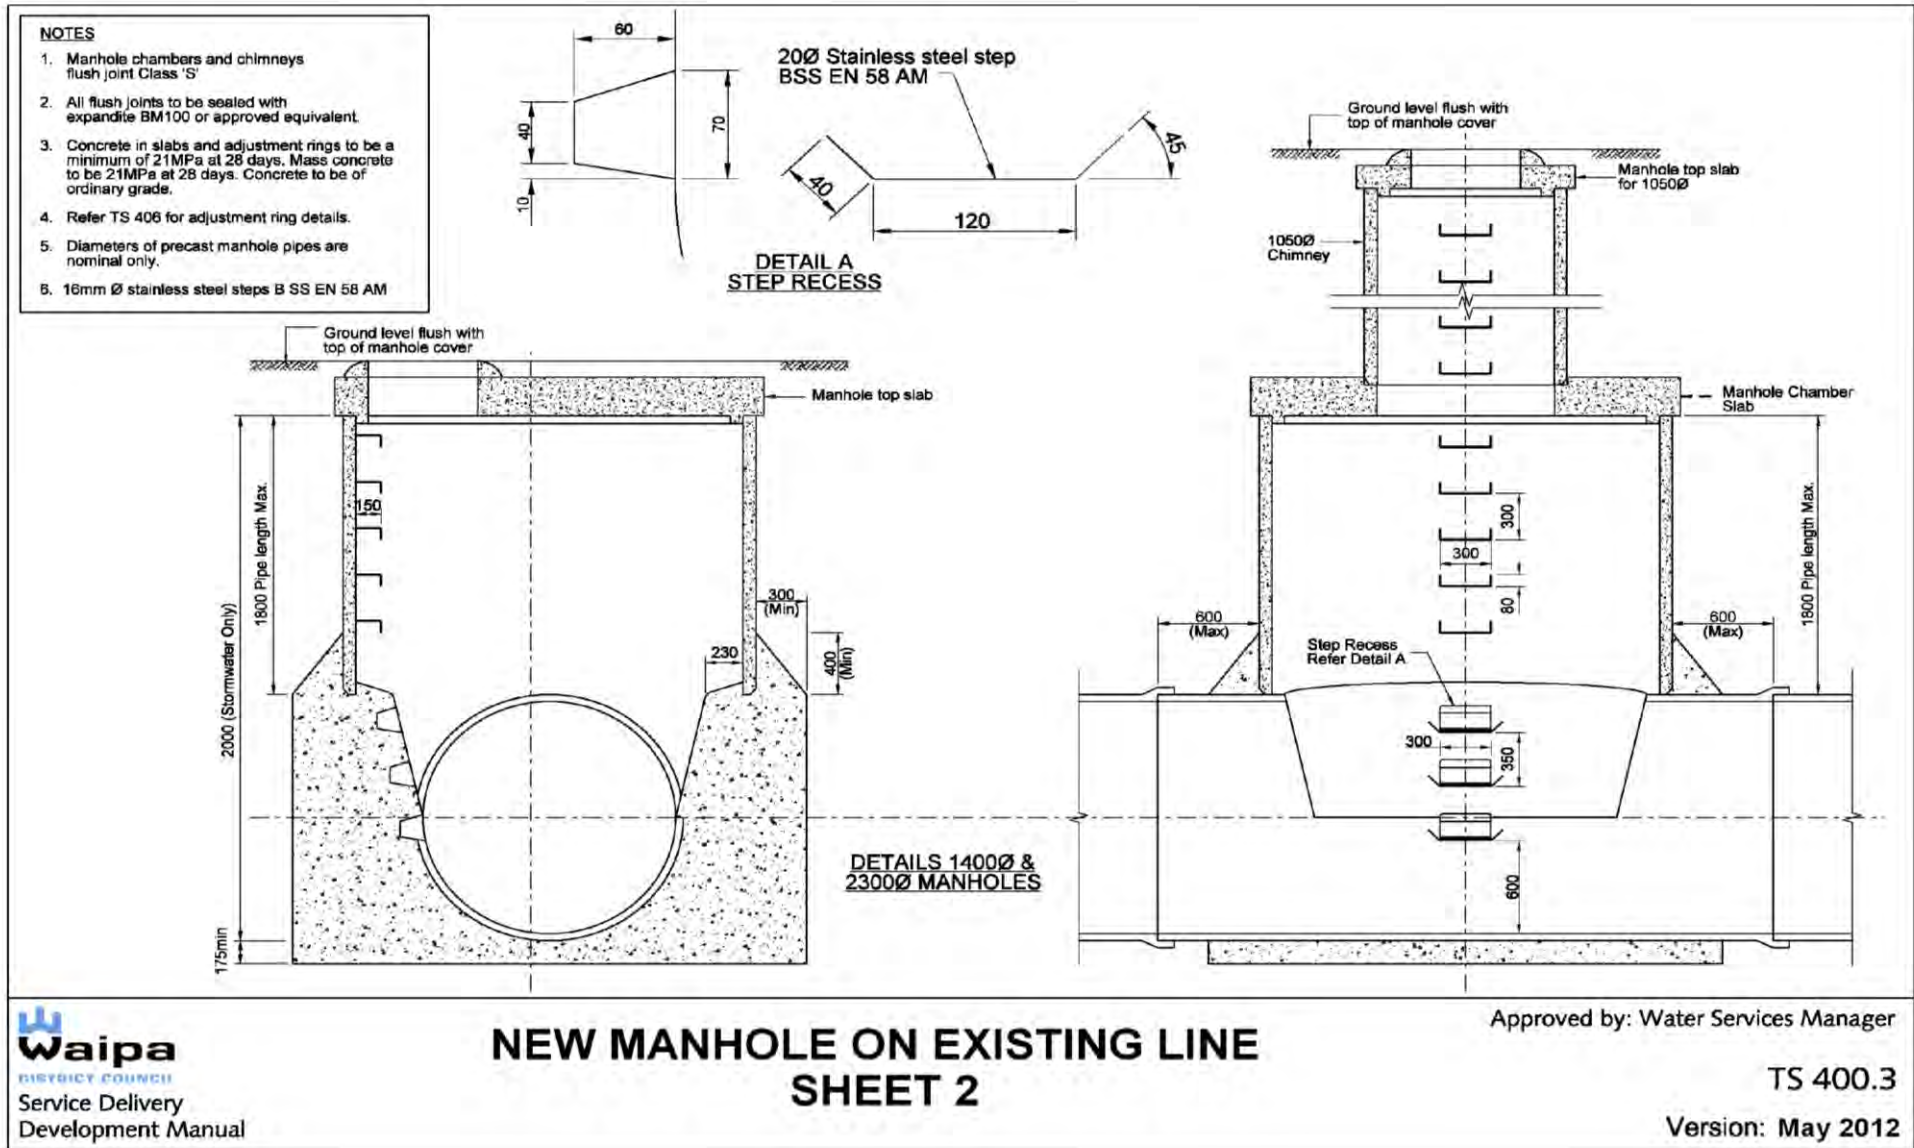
TS 400.3 New manhole on existing line (sheet 2)
